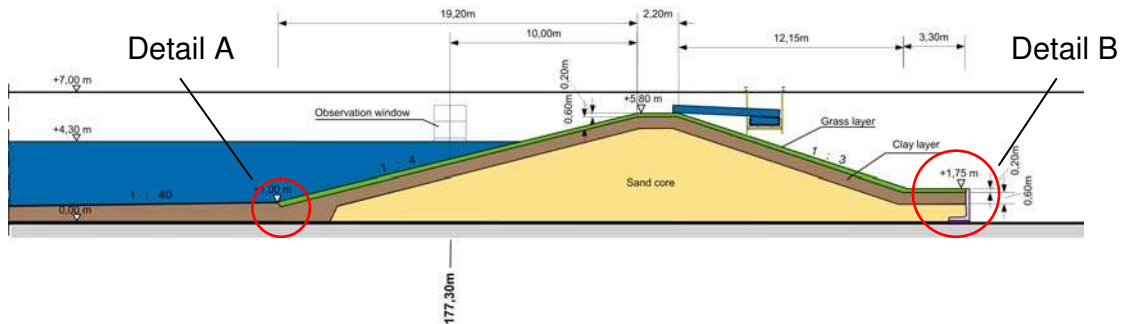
Cross section of the dike model showing the construction details A and B.
